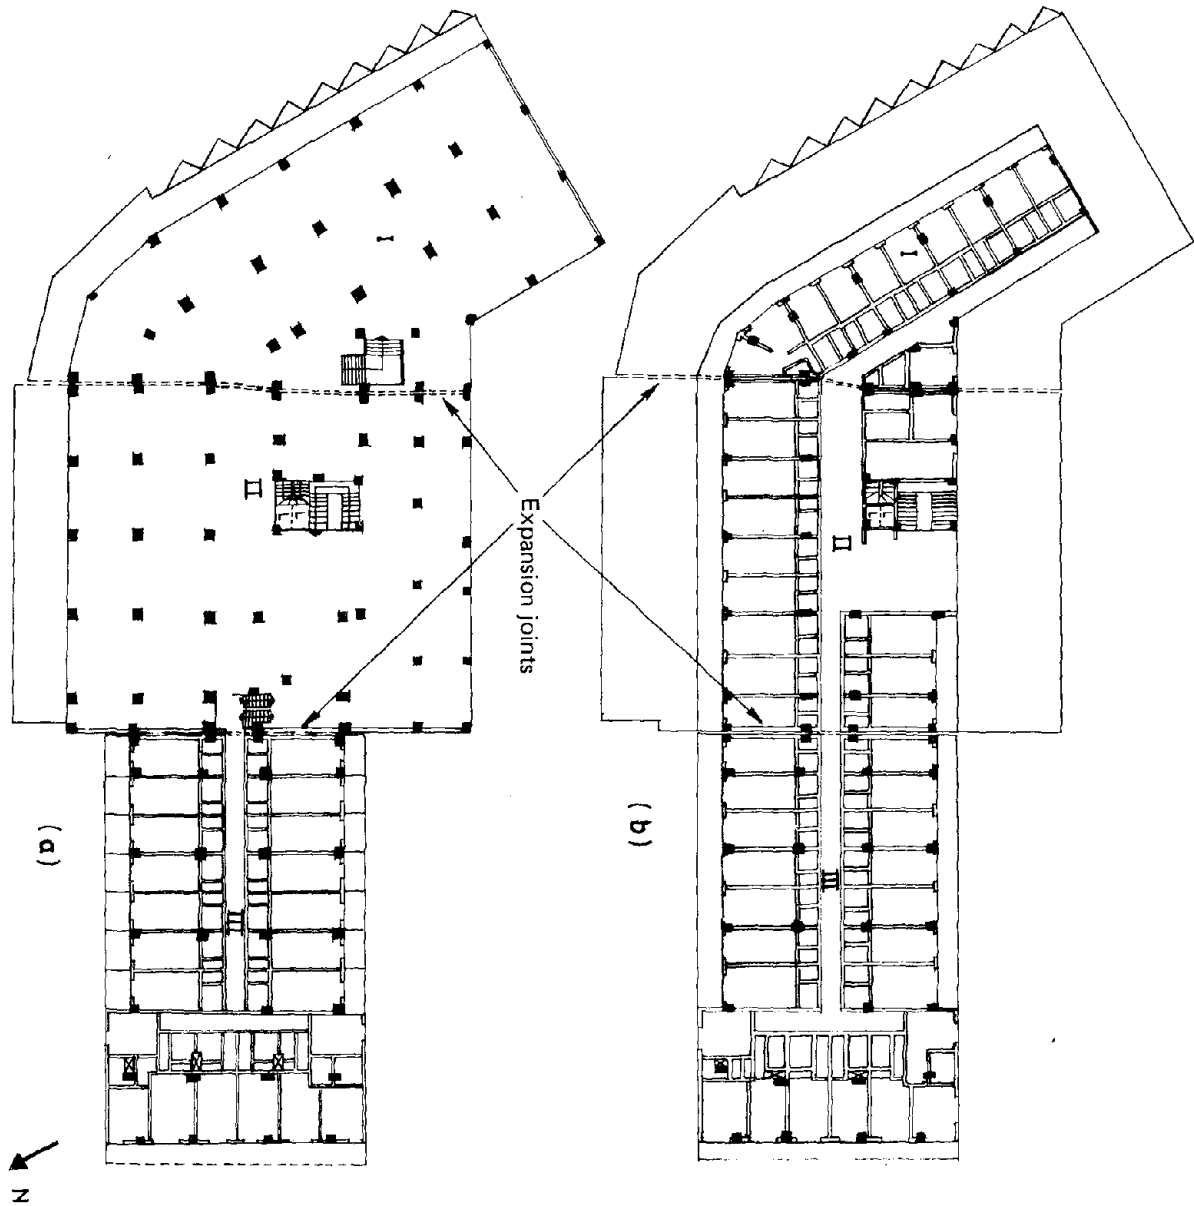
Galaxy Hotel in Vrahati. General architectural plans: (a) first floor, (b) typical floor.
